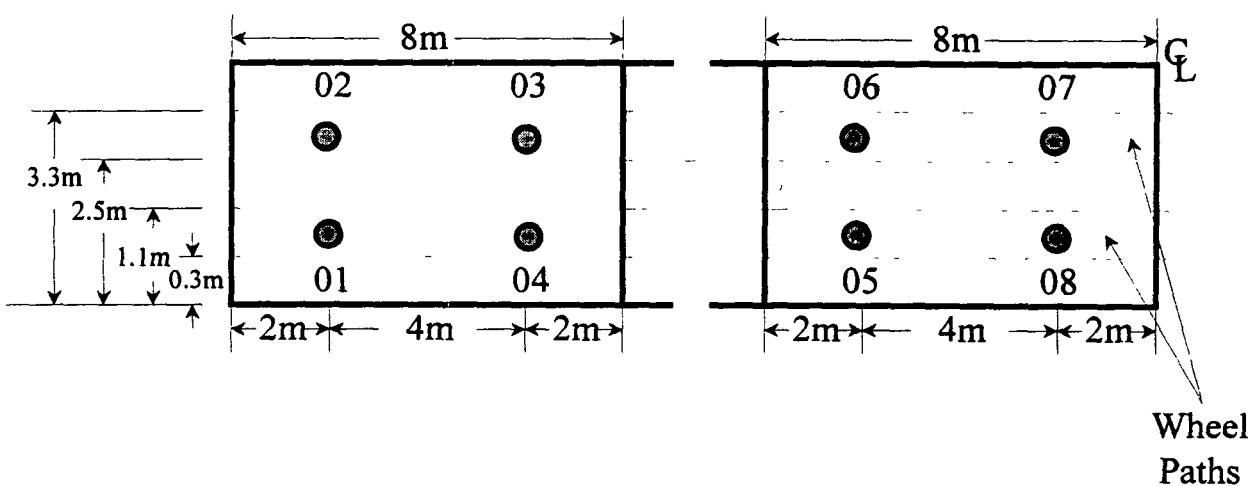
CORING AREAS FOR SPS-9A TEST SECTIONS
